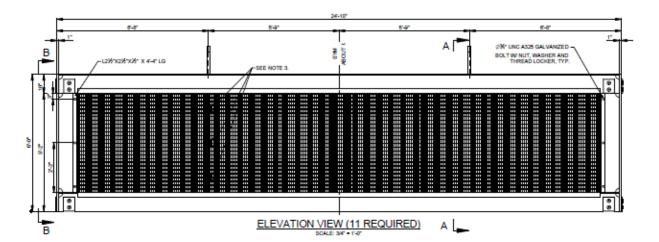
The Dalles AWS Backup System Trashrack, Elevation
